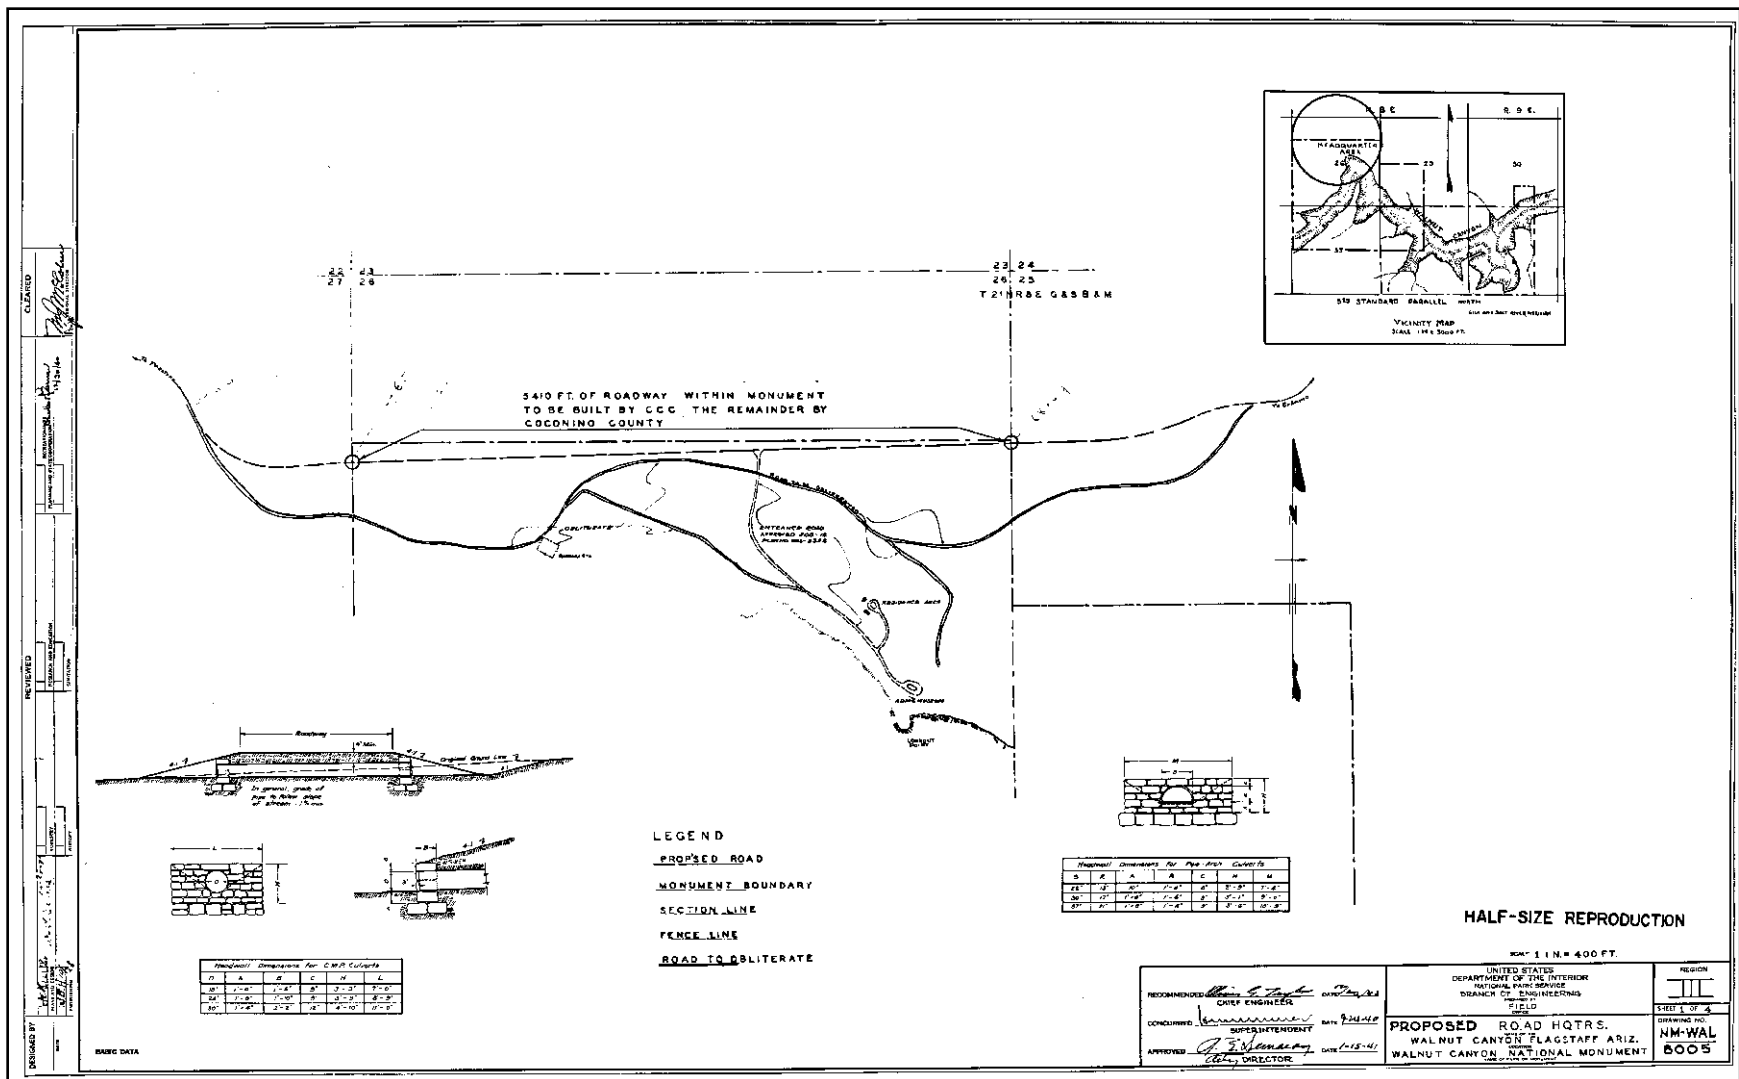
1941 map (NPS Dwg NM-WAL 8005, sheet 1) showing realignment of County Road 303 and construction of new spur road to connect with CCC-constructed entrance road (note culvert design).
